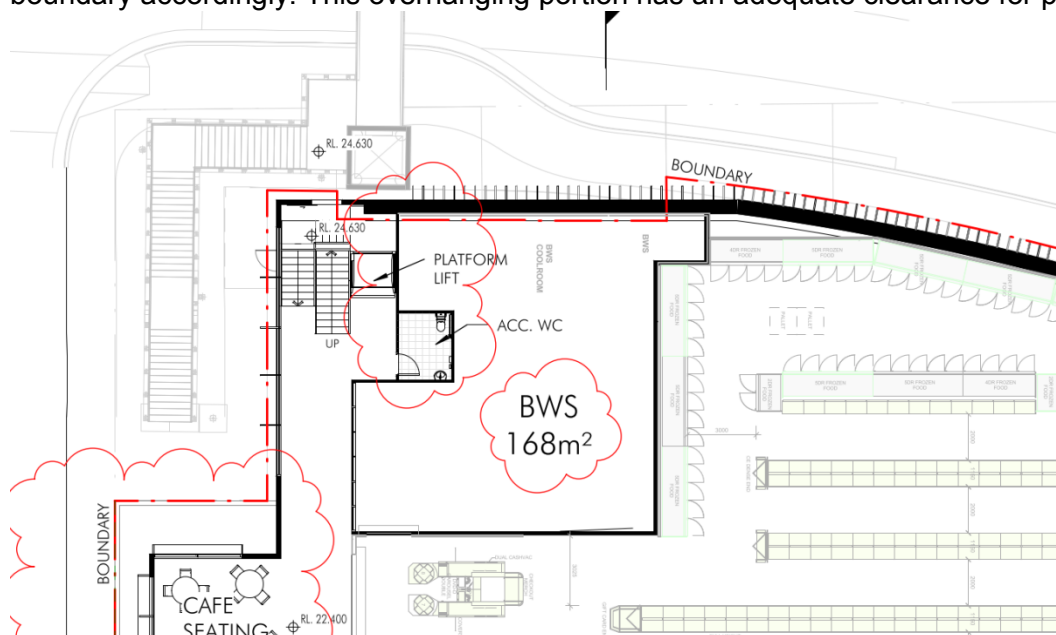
Floor plan showing corner of Parramatta Road and Bland Street as well as the pedestrian bridge.
